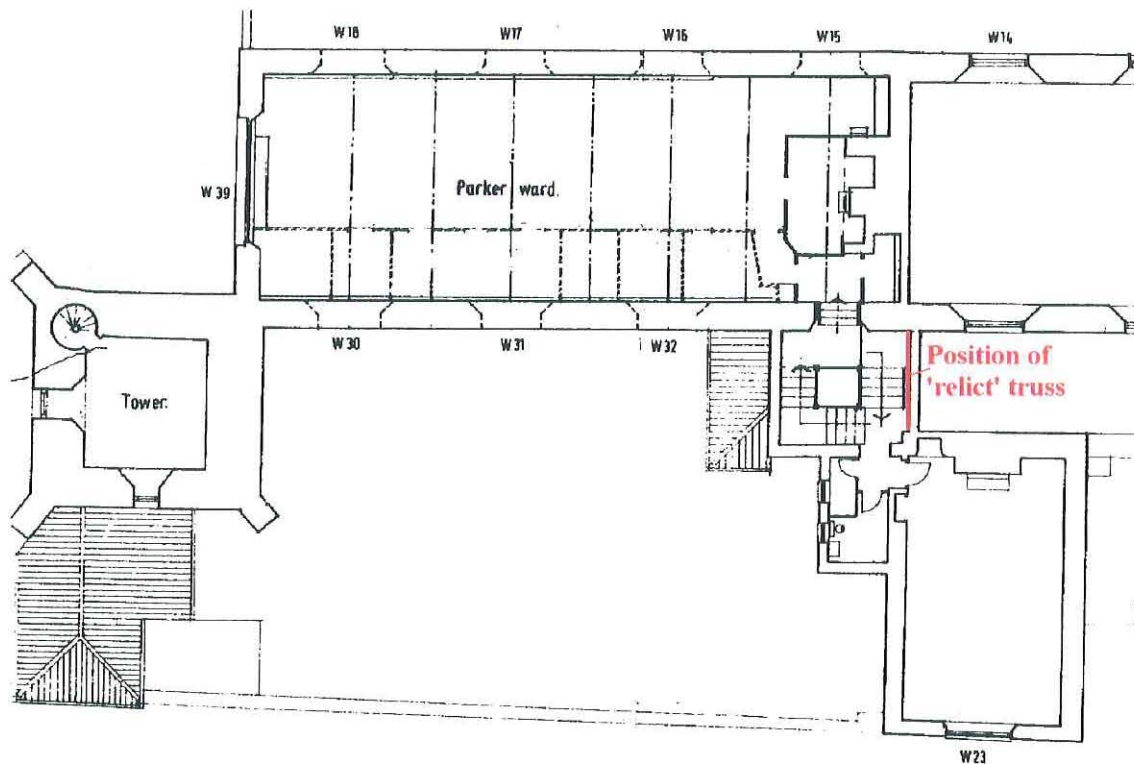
Plan of the first floor of part of the Great Hospital complex, showing the position of the truss sampled (adapted from original drawings by Wearing, Hastings and Norton, Norwich)
